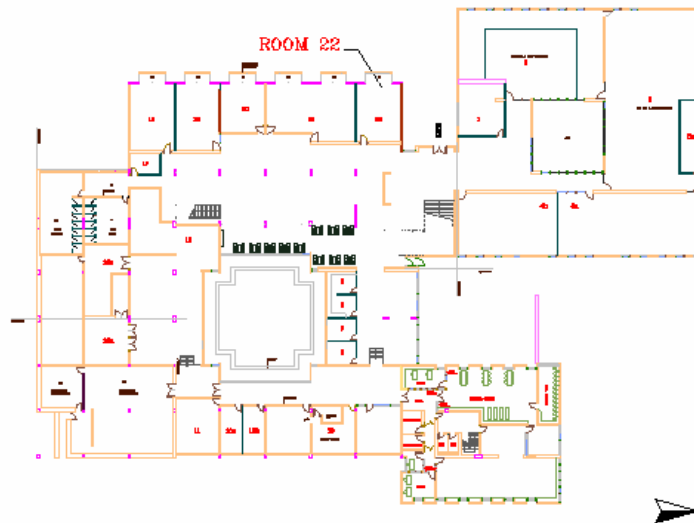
Basement floor plan of the case-study building. ( the course of building science 566)
